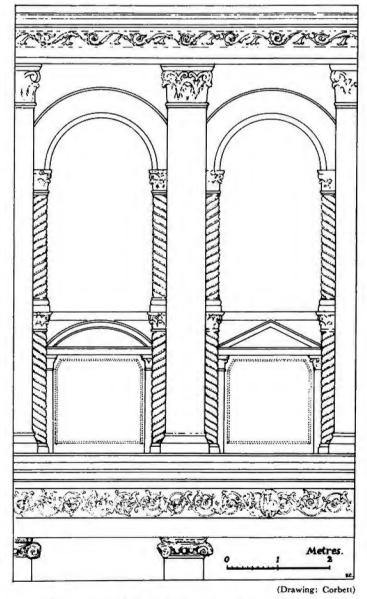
S. Maria Maggiore, Reconstruction, elevation of clerestorey
